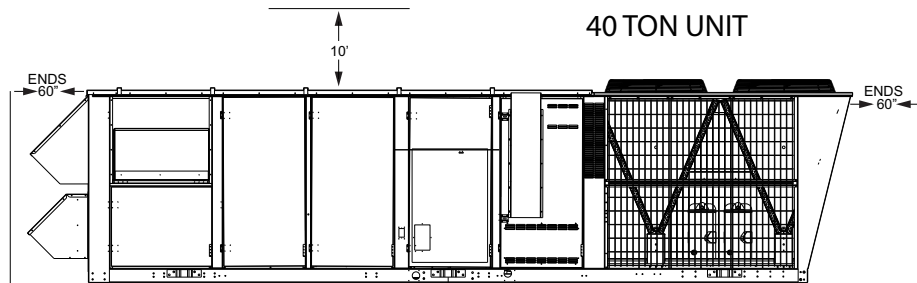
CLEARANCES - HOOD/ECONOMIZER & MOTOR DRIVE - SIDE
